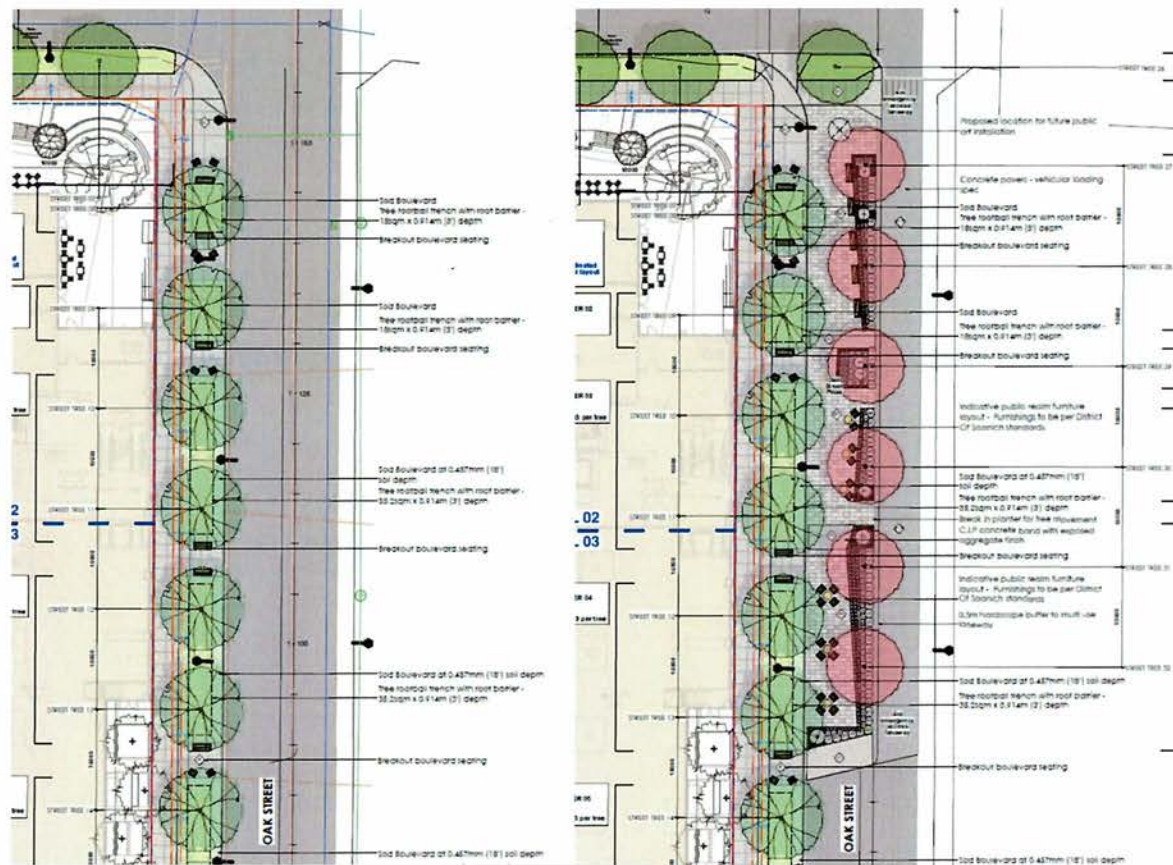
Phase 1 (left) Oak Street Frontage Landscape Plan Phase 2 (Right) Oak Street Frontage Landscape Plan, provided by Durante Kreuk Ltd. Landscape Architects.
